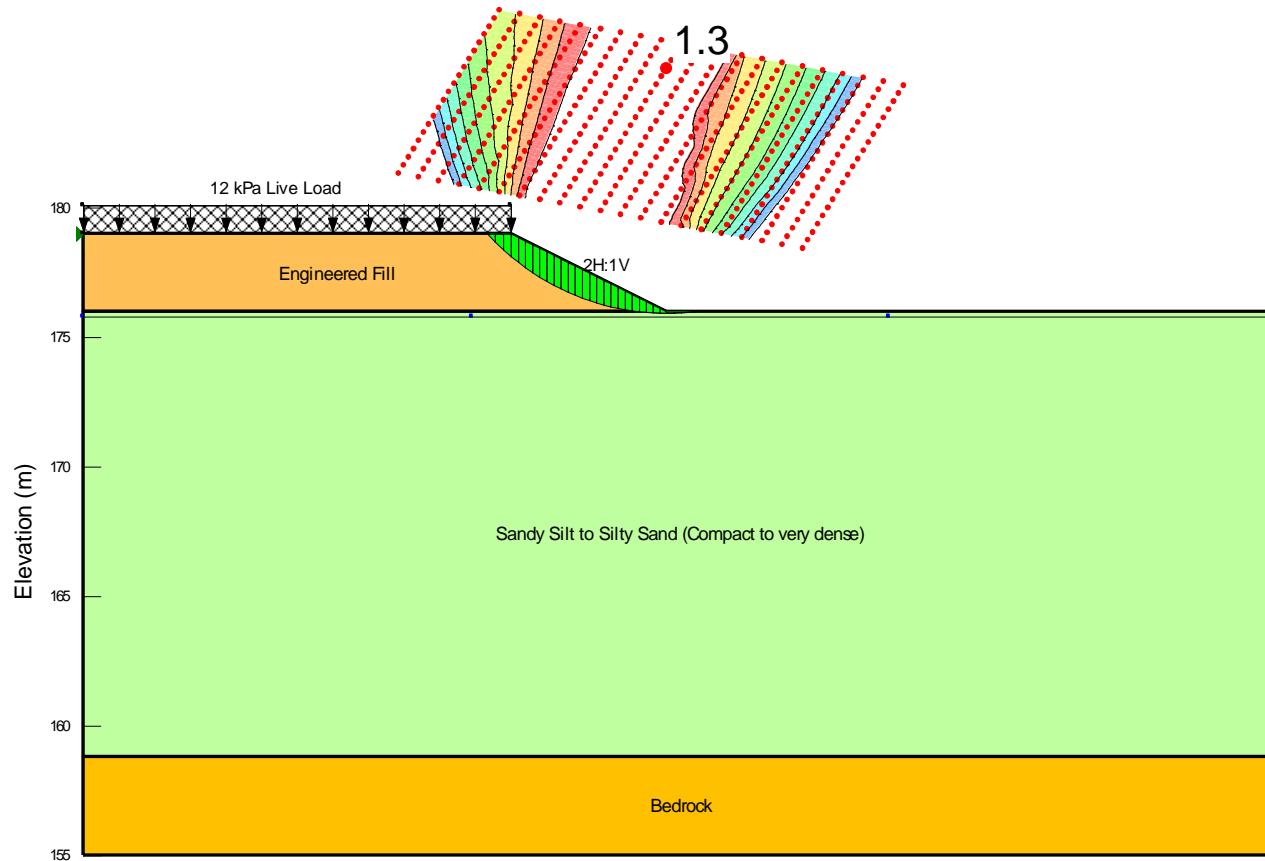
Proposed Permanent Bridge South Embankment - Drained Seismic Condition
